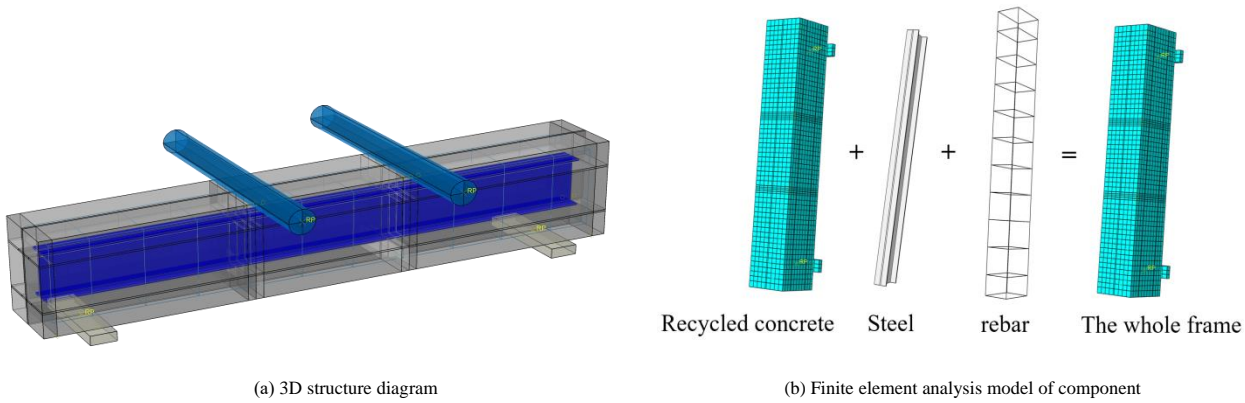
Schematic diagram of steel reinforced recycled concrete beam
